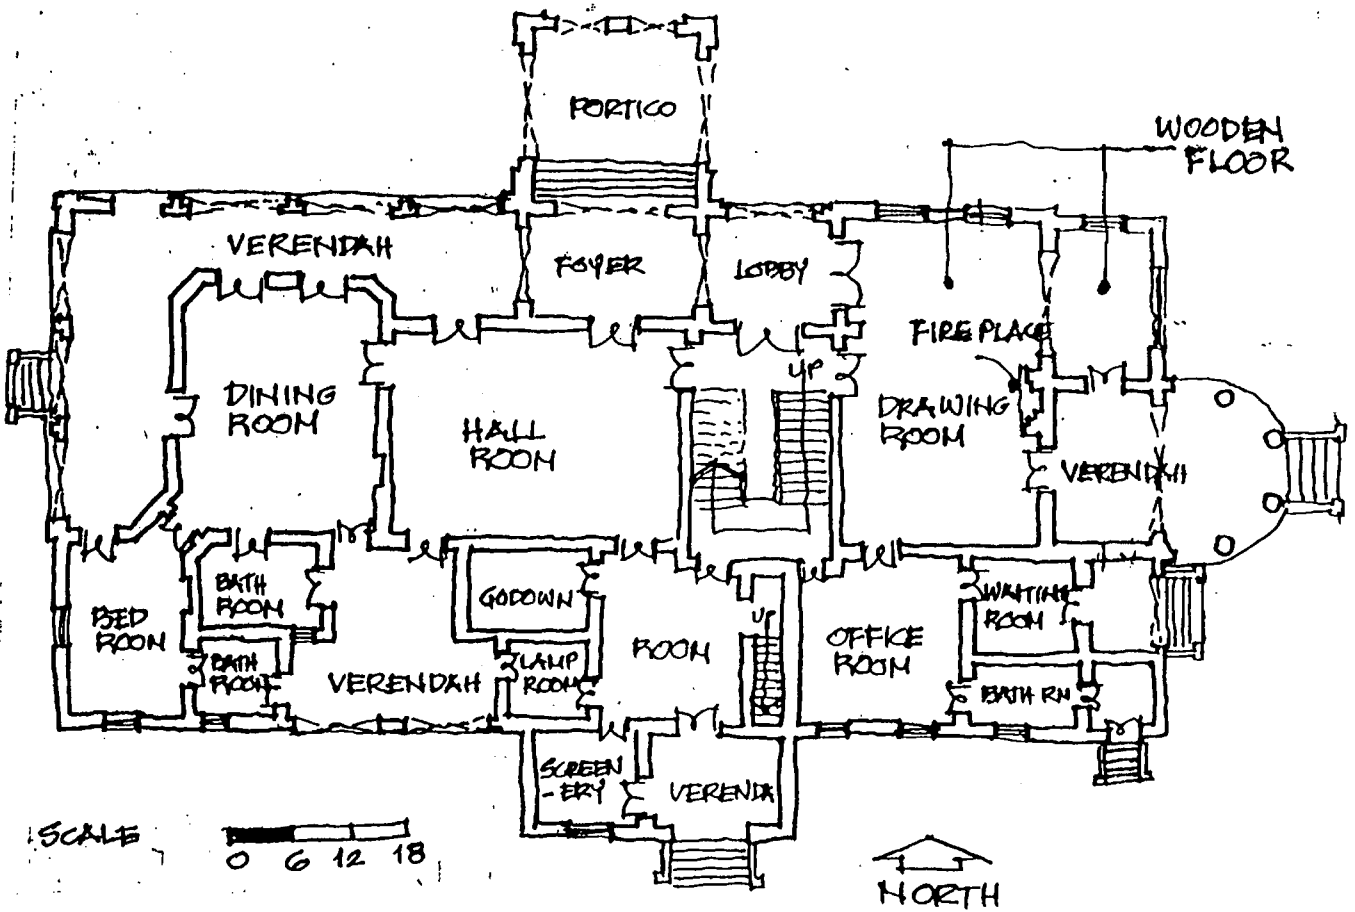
Ground floor plan, Bardawan house, Dhaka
